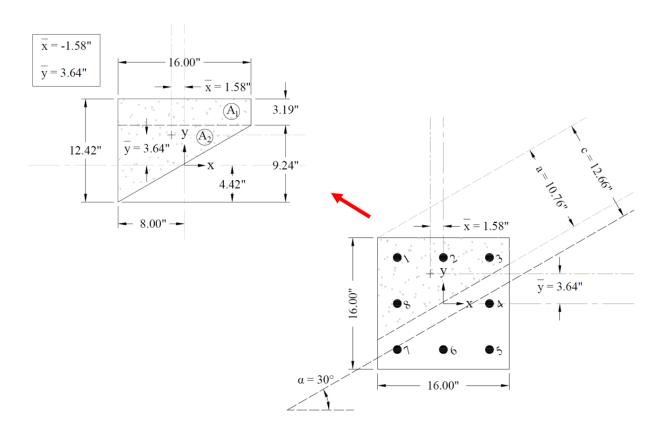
Cracked Concrete Column Section Centroid Calculations
